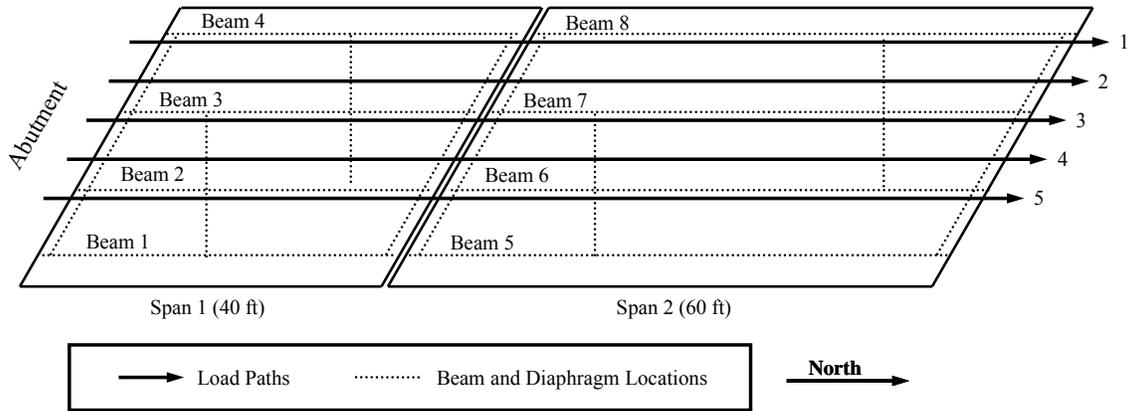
Plan View of Load Paths for Chandler Creek Bridge
